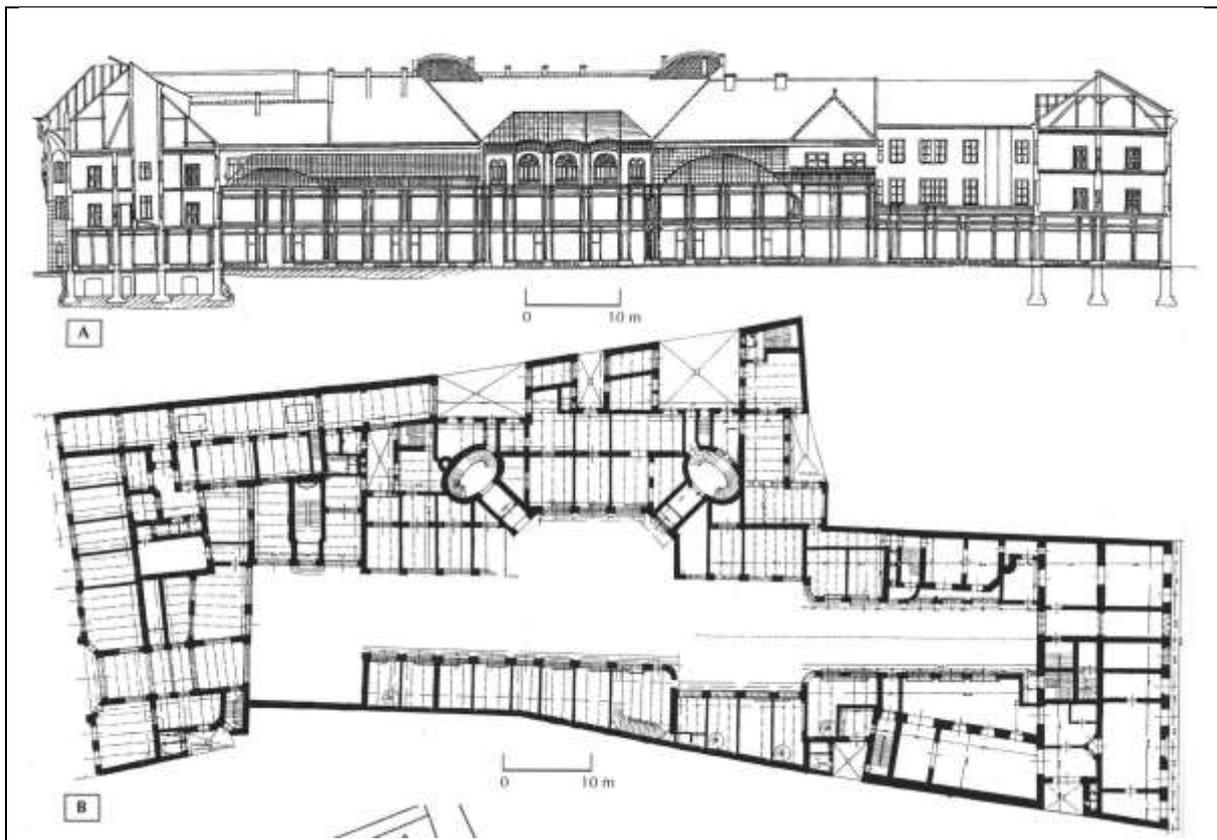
Archival plan and cross-section of the building of the Mikolyash passage in Lviv (Lewicki, 2005).
